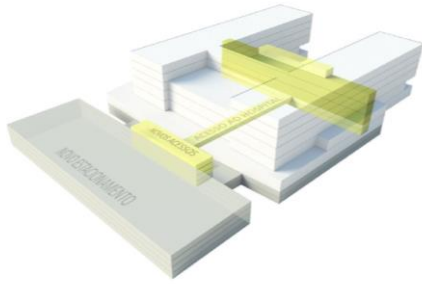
Connection between the old car parking and the new one (Risco, 2013)
